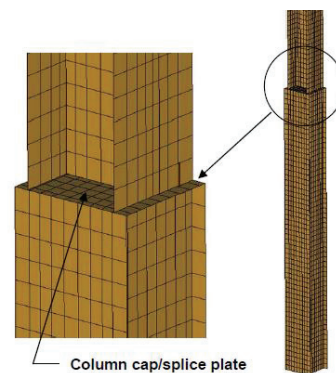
Details of box column-to-wide flange core column splice [Federal Emergency Management Agency, 2002]
